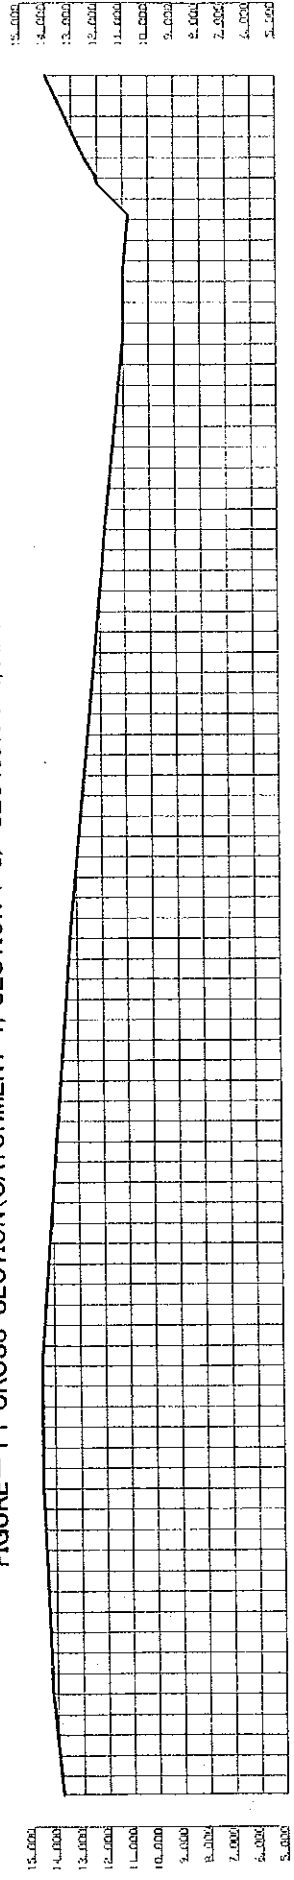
CROSS-SECTION (CATCHMENT-1, SECTION 1-5)
